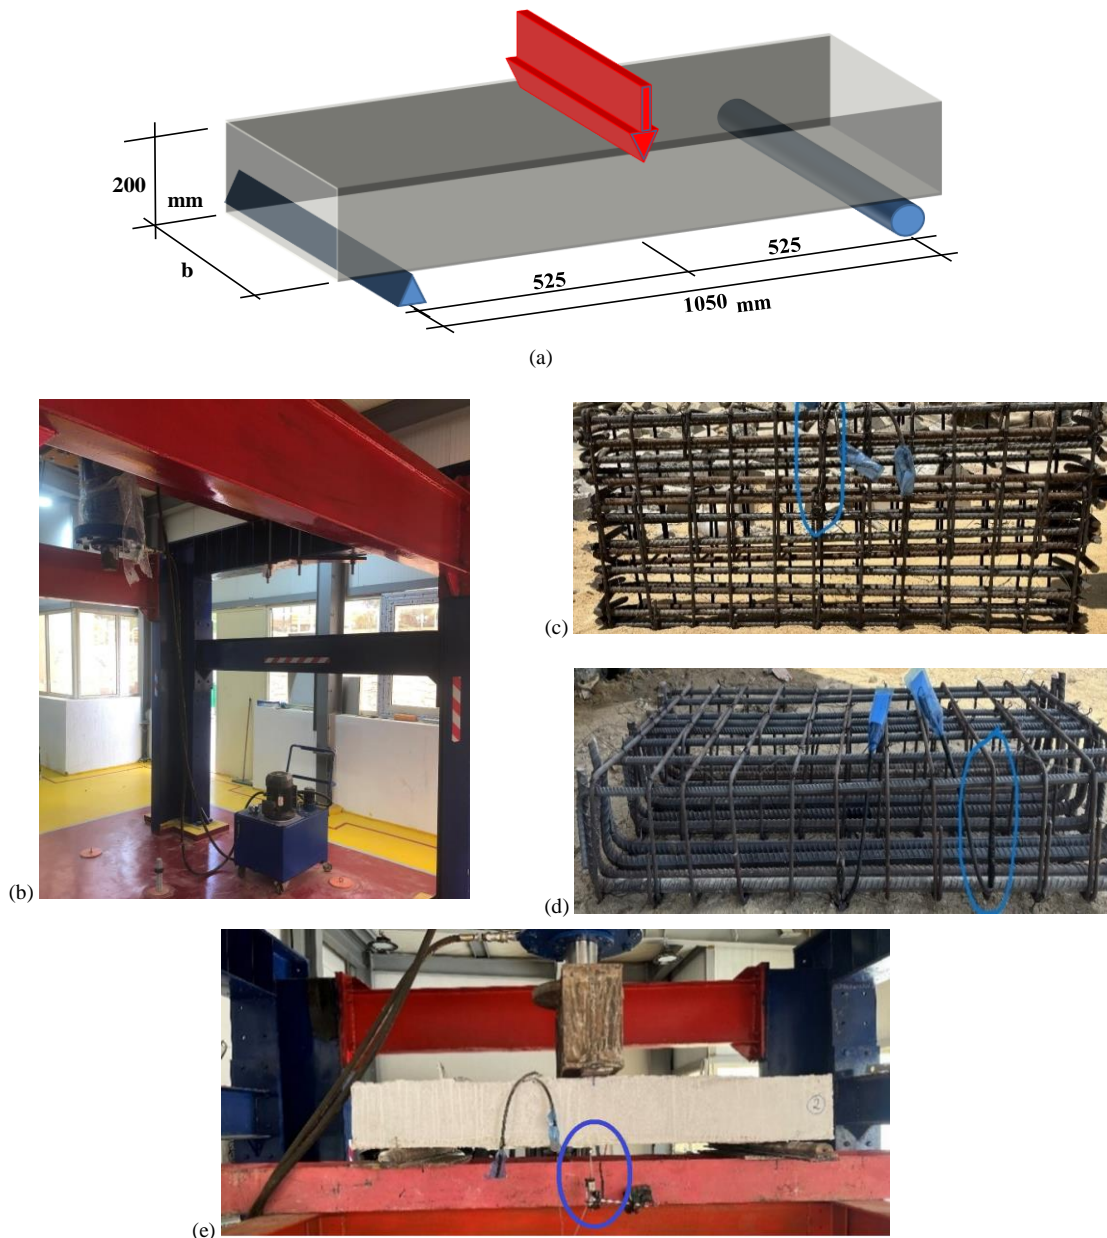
Samples instrumentation & test configurations, a) test setup, b) testing frame, c) longitudinal rebars strain gauge, d) stirrups strain gauge, e) LVTDs locations
